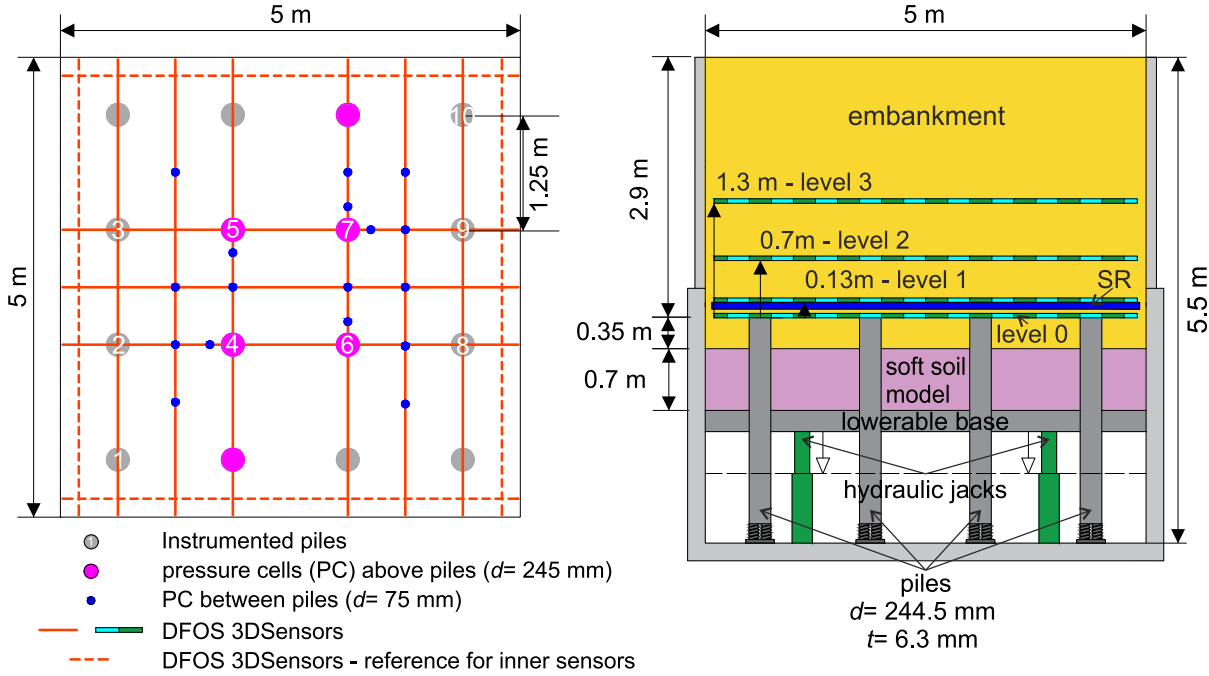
Large-scale test setup for basal reinforced piled embankments.
